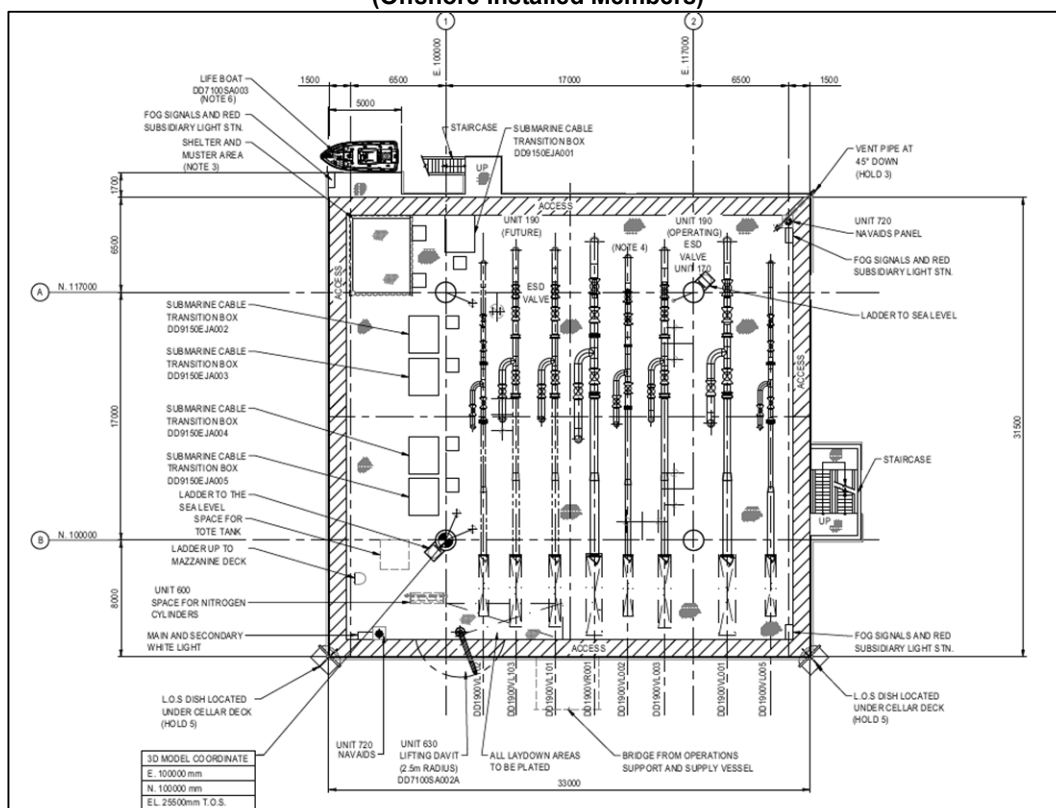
New Douglas Platform – Section of Cellar Deck
